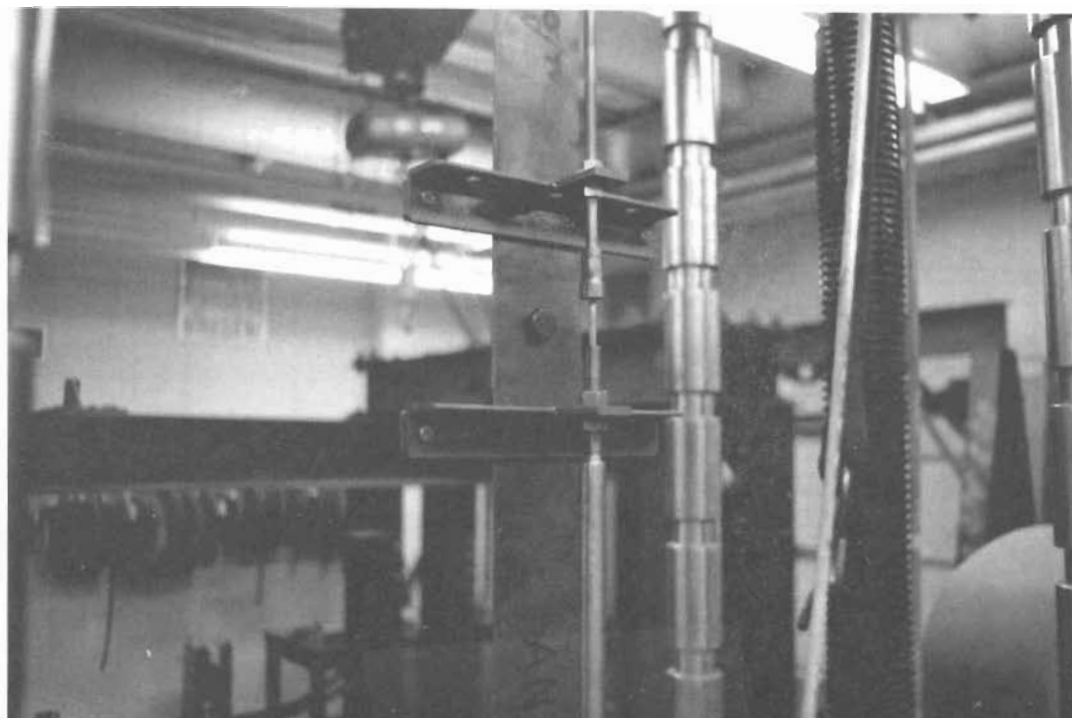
Photograph Of LVDT Attached To A Typical Test Assembly (Type A Specimens Shown).
